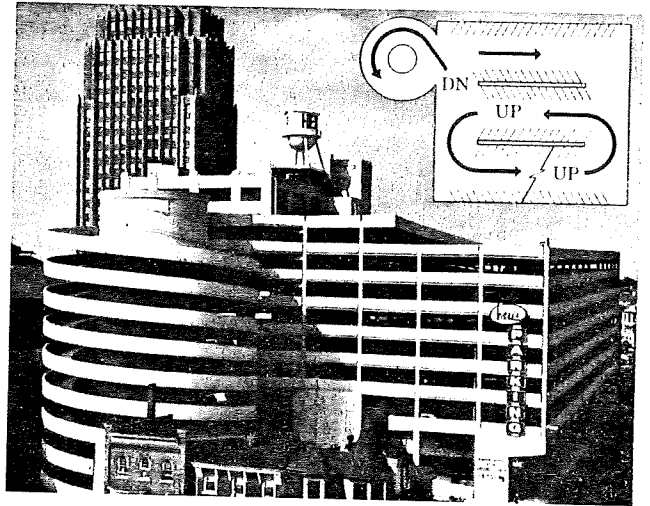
Helical ramps such as this one serving an 8-story, 750-car structure, can be used effectively for express exiting.
